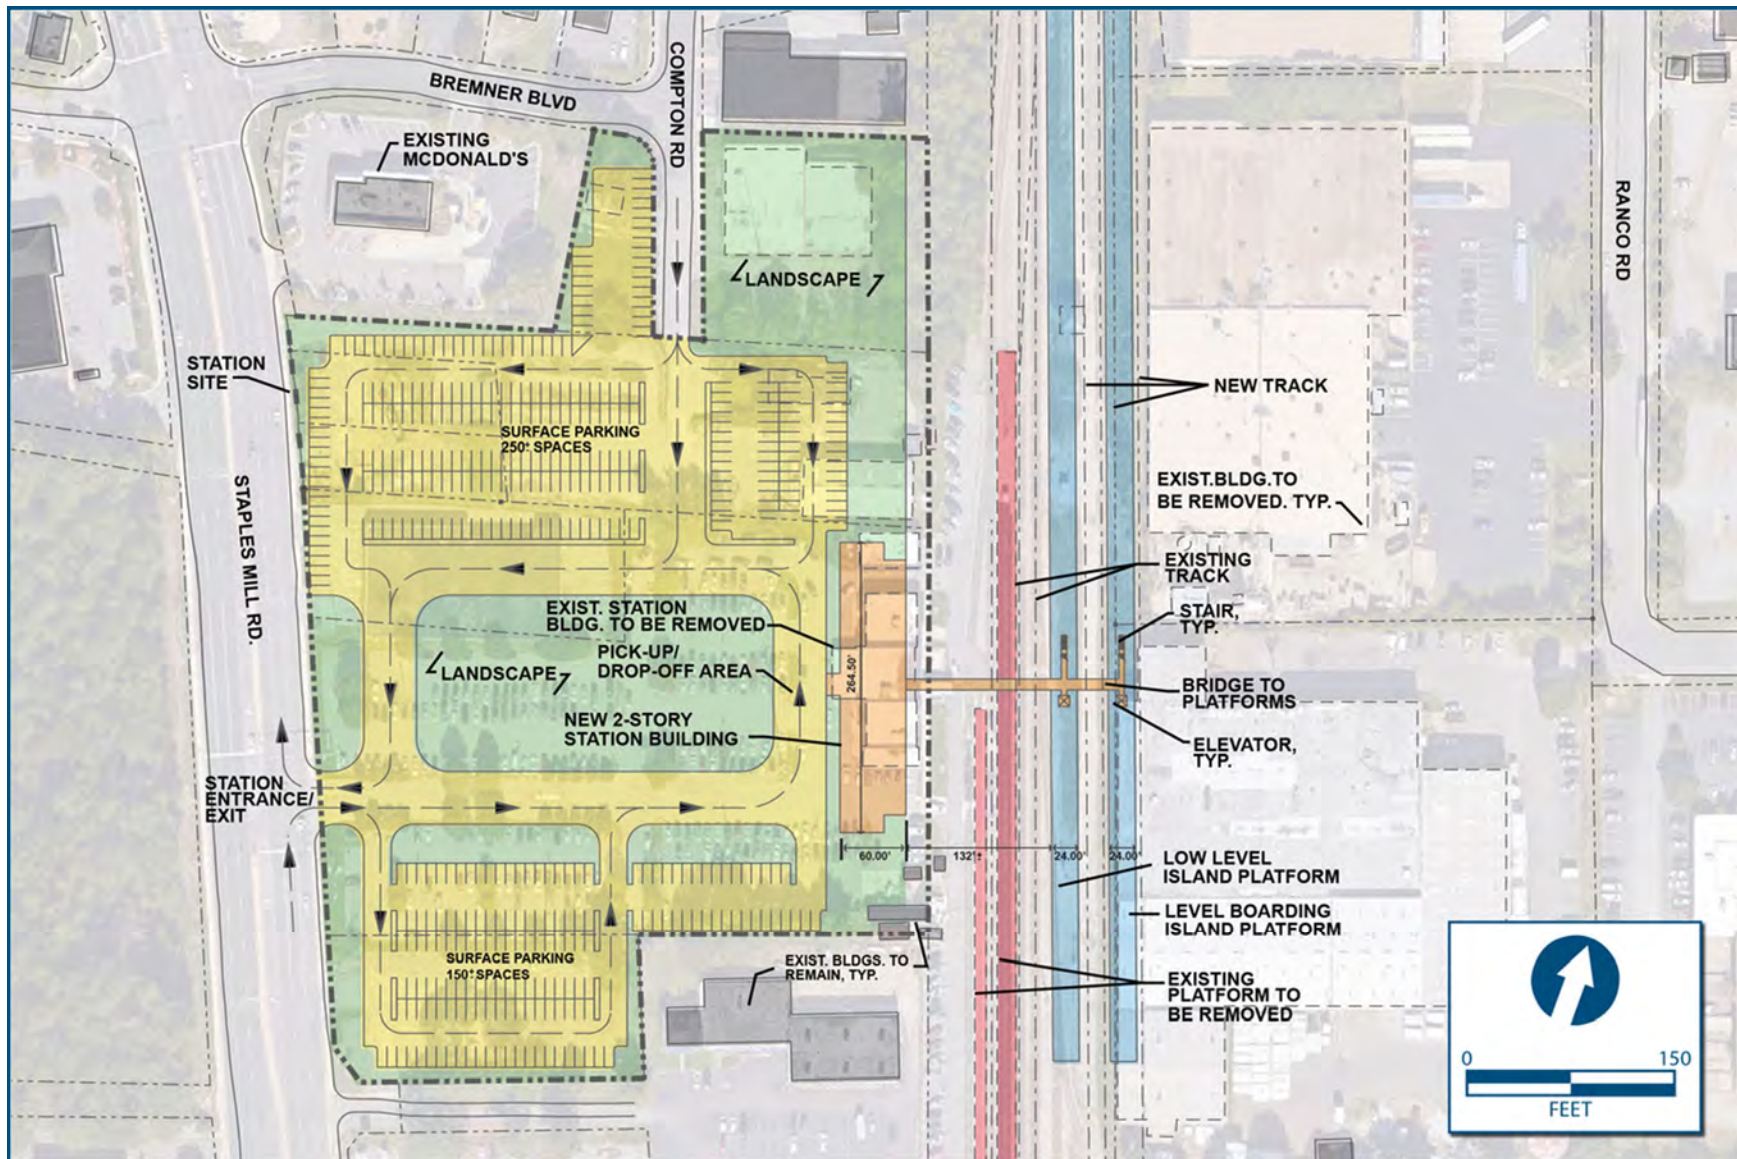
Staples Mill Road Station Improvements for Build Alternative 6F
